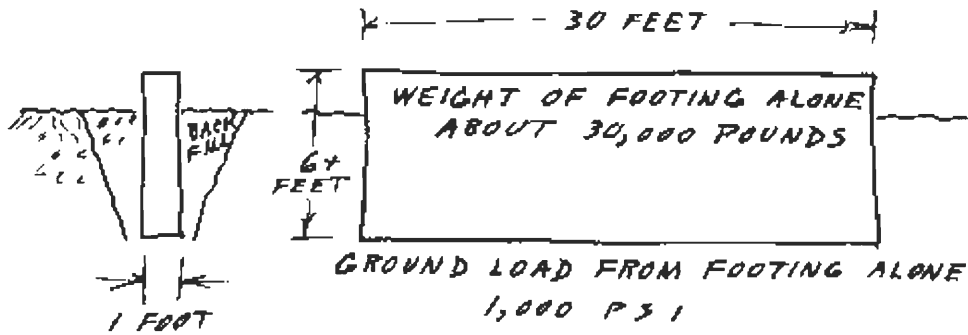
Weight loading of wall footings without sub-footing. (Roberts, 129)
